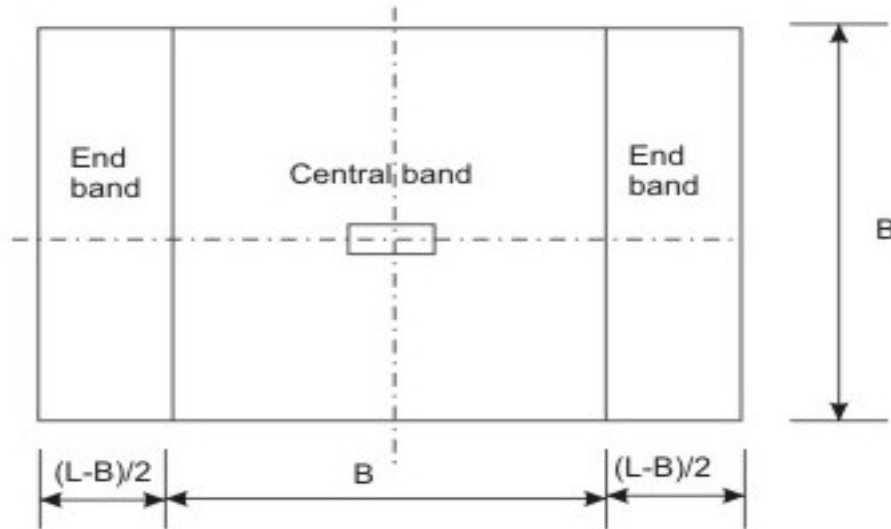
Bands for reinforcement in a rectangular footing
